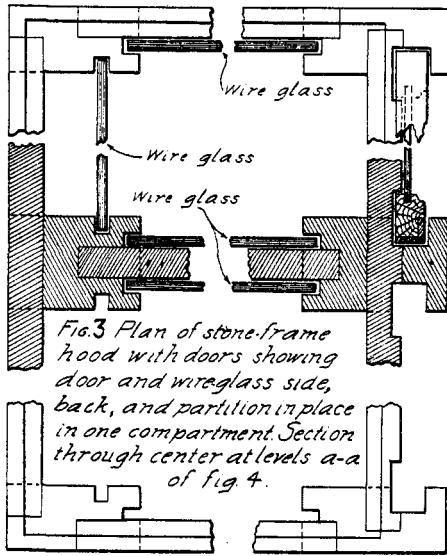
Plan of stone-frame hood with doors showing door and wireglass side, back, and partition in place in one compartment. Section through center at levels a-a of fig. 4.
